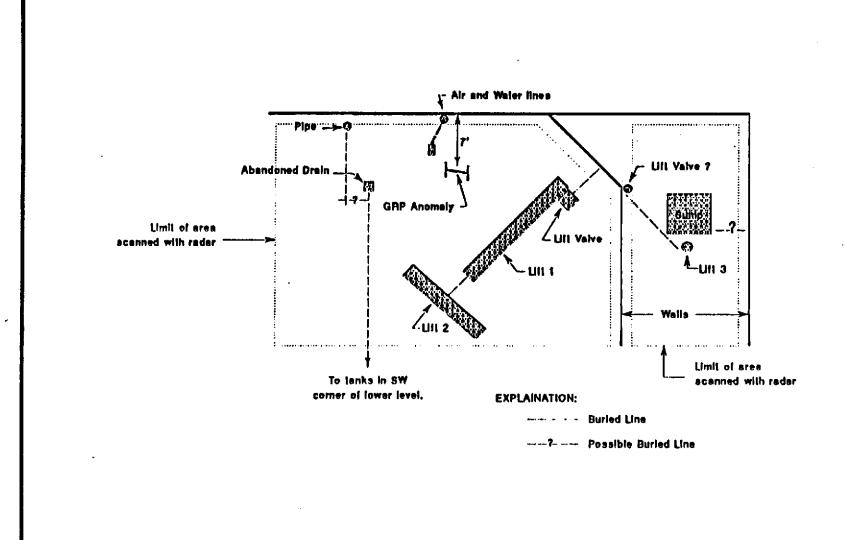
Detailed Site Plan of Hydraulic Lift Area in upper Harrison Street Garage, Showing Lift and associated Piping and Suspected Underground Fluid Reservoir (GPR anomaly) areas
